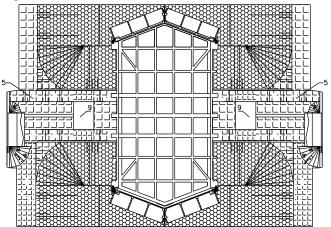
Plan view of one unit caisson sluice with 4 hydraulic automatic gates
